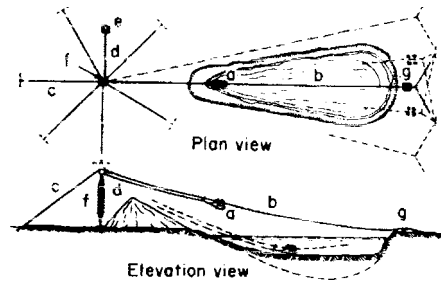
Slackline-cable plant. (Sauerman.)
